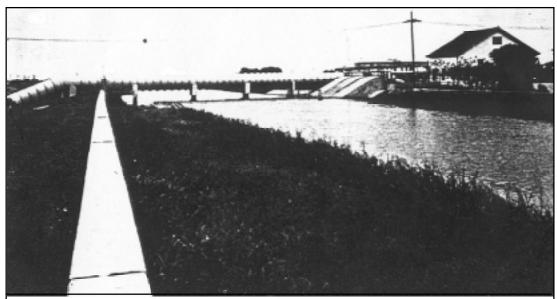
Drainage Pumping Station No. 4, 1962, showing new 10' steel siphon over the London Avenue Outfall Canal (from Sewerage and Water Board 1962).
